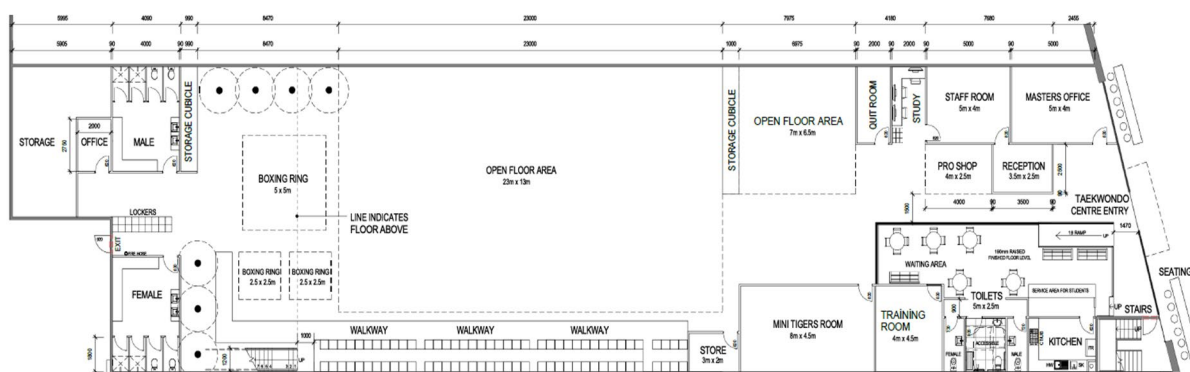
SITE CONTEXT PLAN (SOURCE: MAP ARCHITECTURE & DESIGN PTY LTD)
